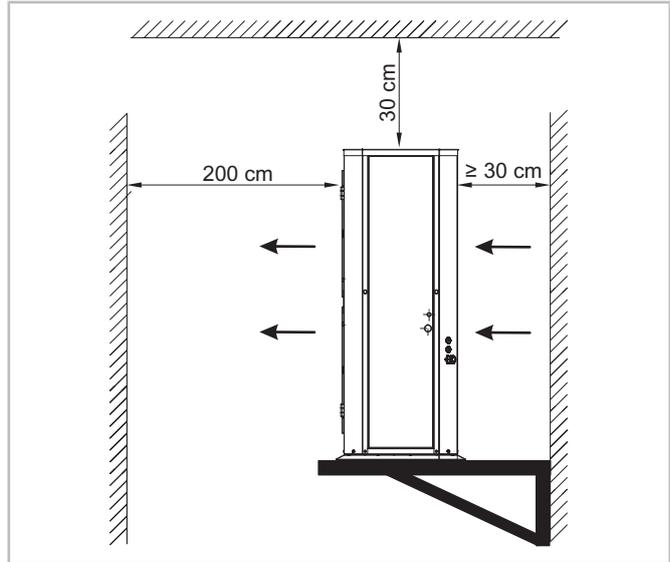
Minimum distances to the wall and ceiling when mounted on a mounting bracket (example shows LHL5E/ ..)
